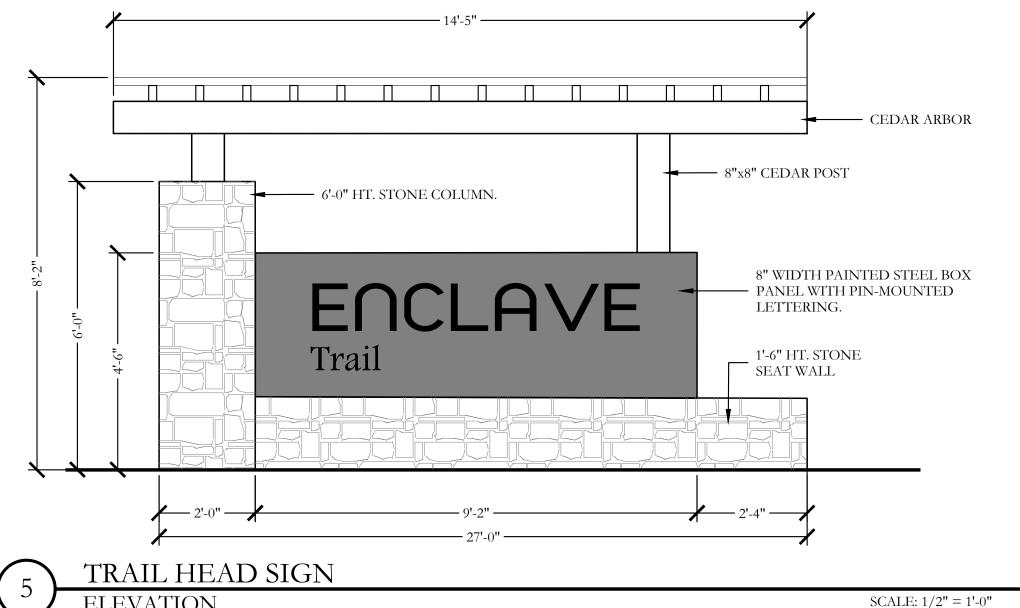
EXHIBIT F CONCEPTUAL LANDSCAPE PLAN
